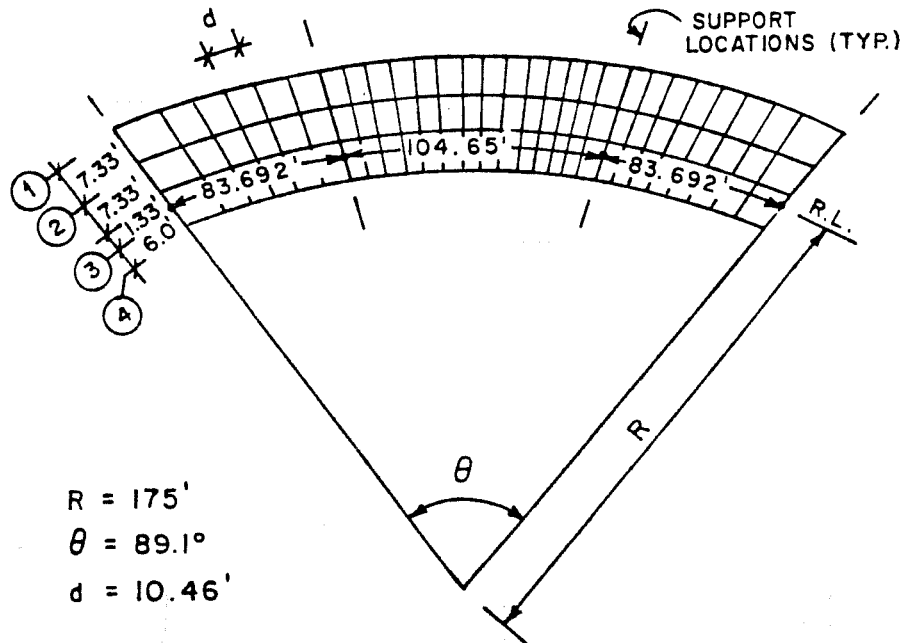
Plan view of four-girder, three-span bridge unit.
